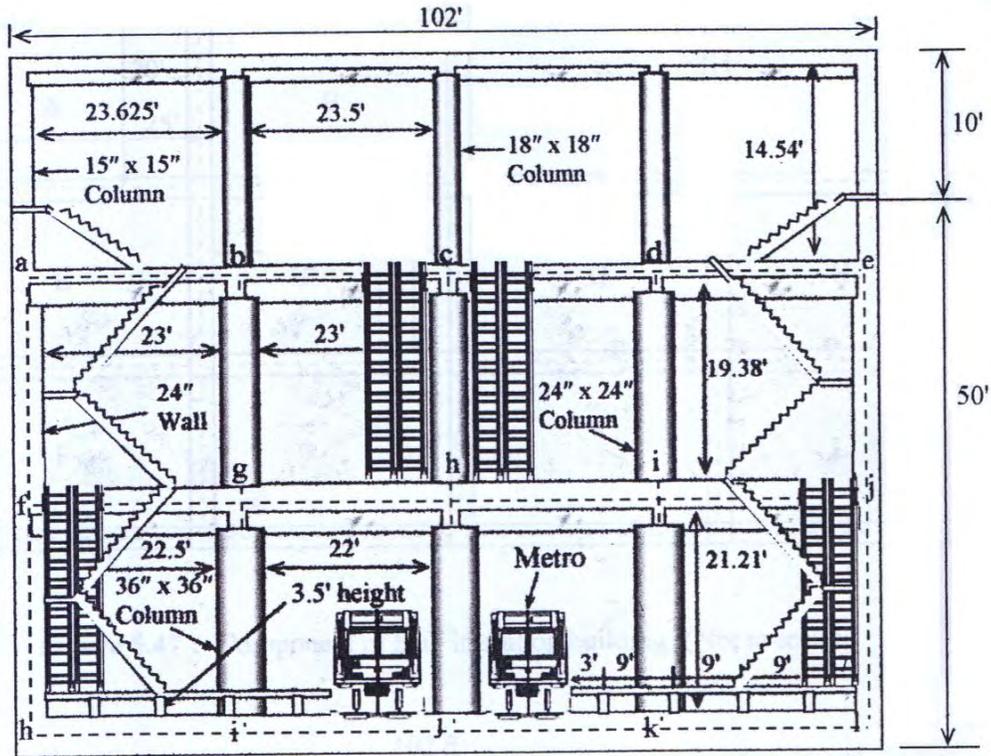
Cross Section of Station Building in Y-Y direction (Not to Scale) (Waheed, 2008)
